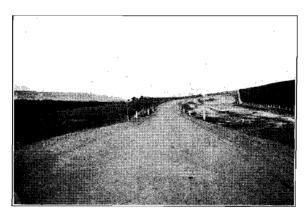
Showing new section of Murray Valley Highway beyond Tallangatta.
